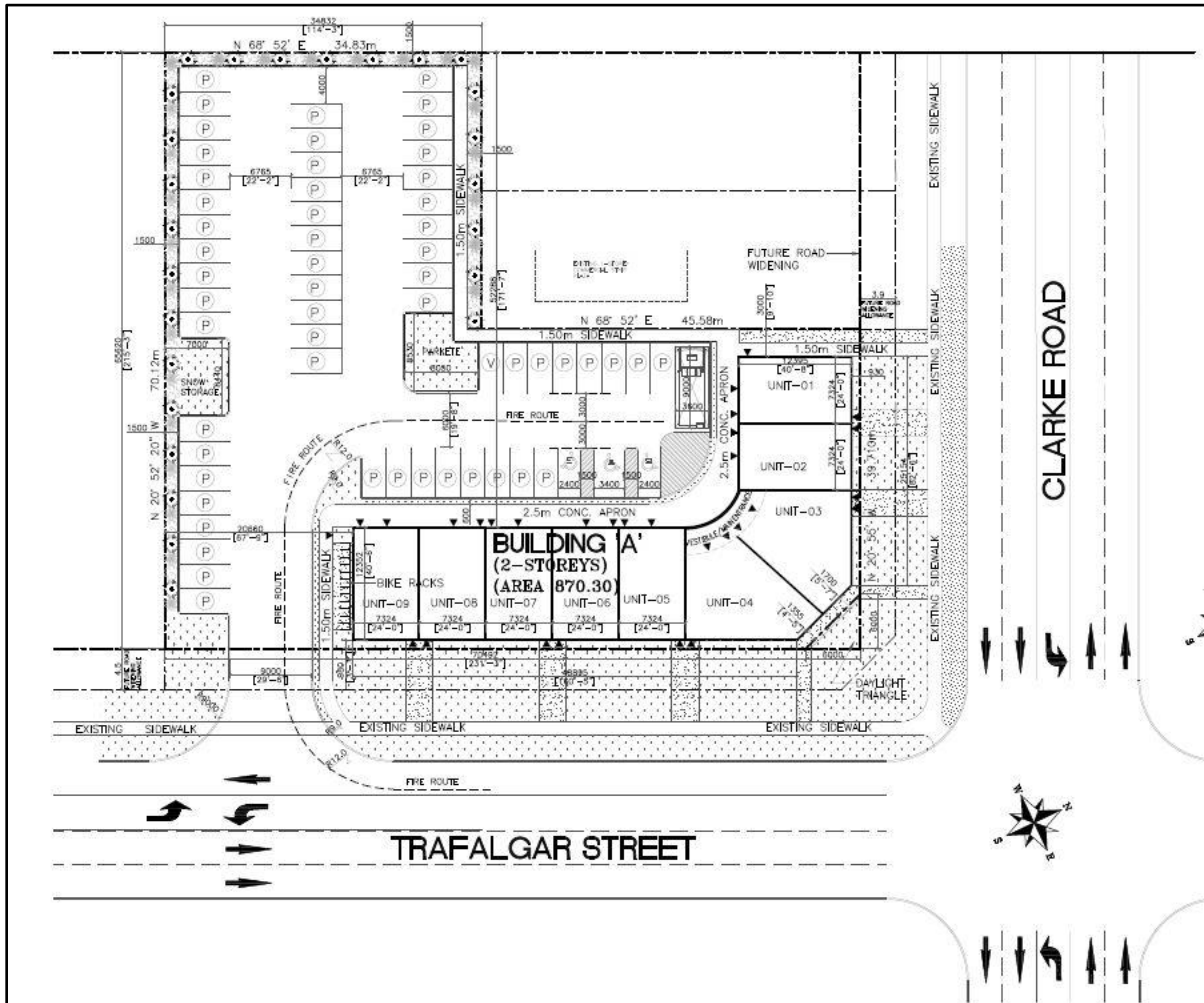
Conceptual Site Plan (Received November 18, 2022)
